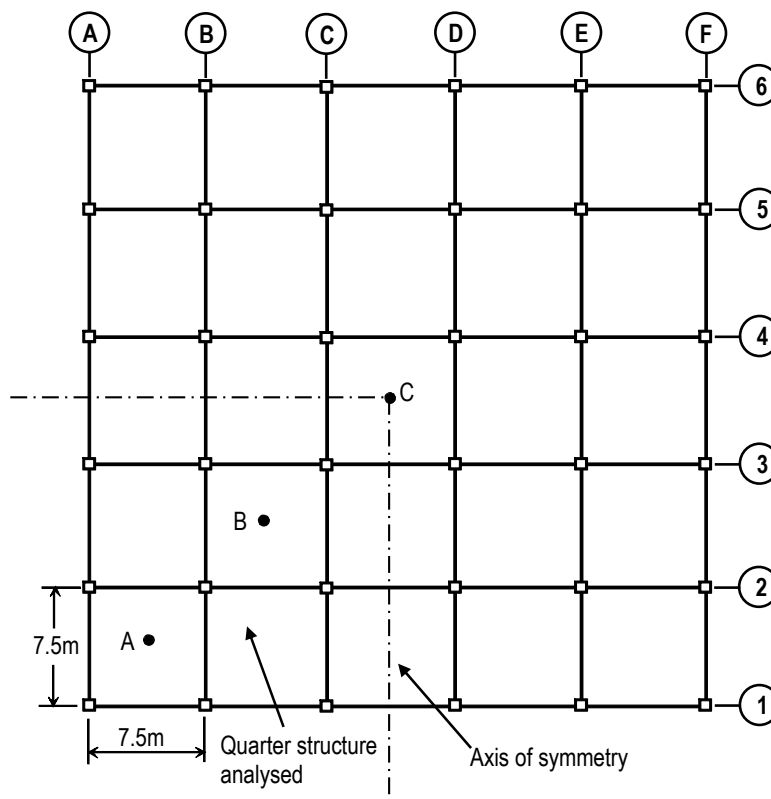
Concrete structure layout for whole ground floor heated by the ISO384 fire.
